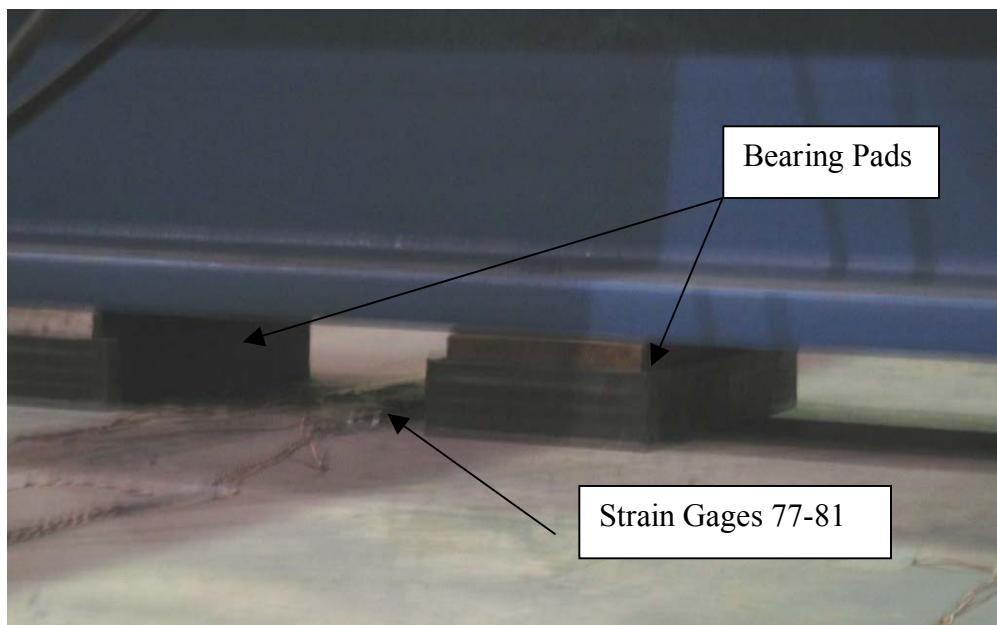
THE JOINT BETWEEN PANELS 3 AND 4 – FULL SCALE LOADING
